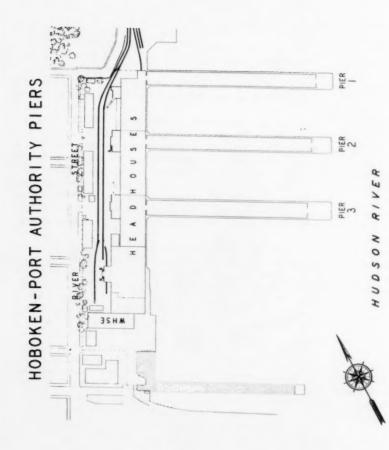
Hoboken - P.A. Piers - Site Plan at Time of Acquisition by the Port Authority. Piles of Old Pier 6, Previously Destroyed by Fire, Are at the Far Left.
